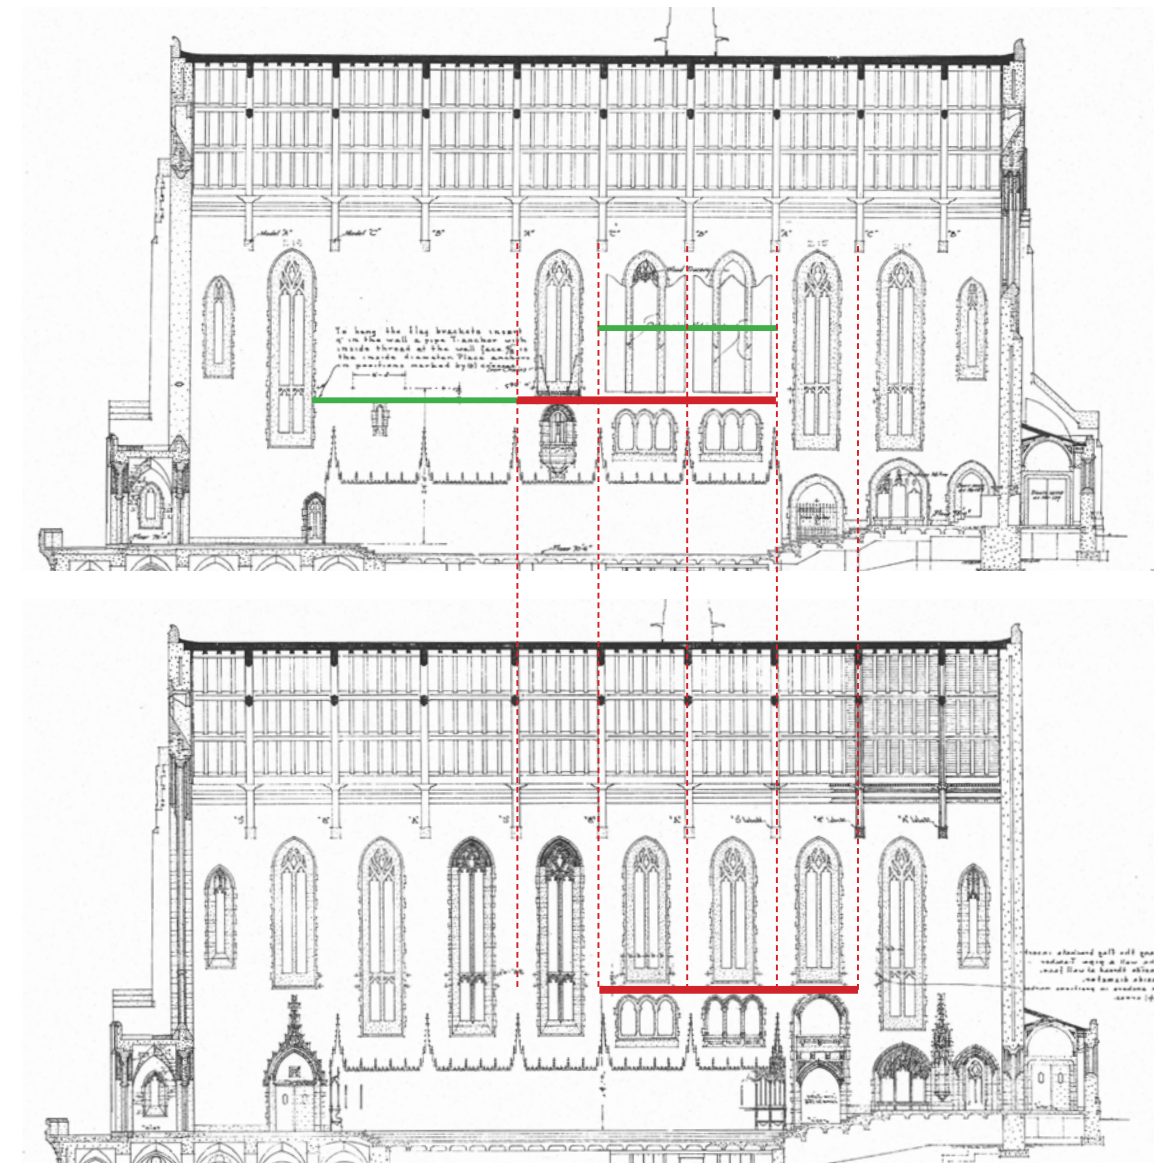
North-South Section facing West and Reflected Section facing East, showing syncopation in clerestory window bays (red), as well as the deanery and organ loft sections (NB: Lower drawing reflected.) (Zantlinger, Borie and Medary)
